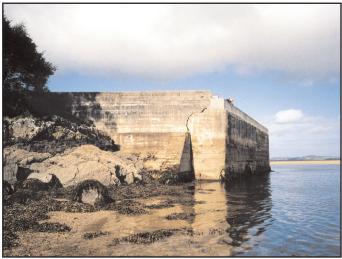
Ards Pier at low water. Photo by Alastair Lings.
